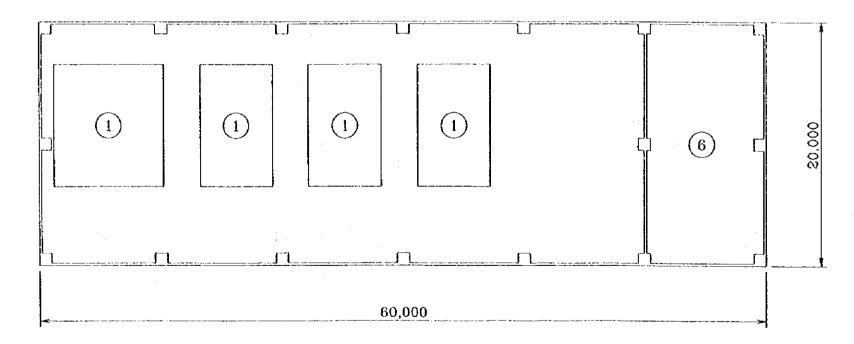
Layout of Air Separation Plant and Plant Air
